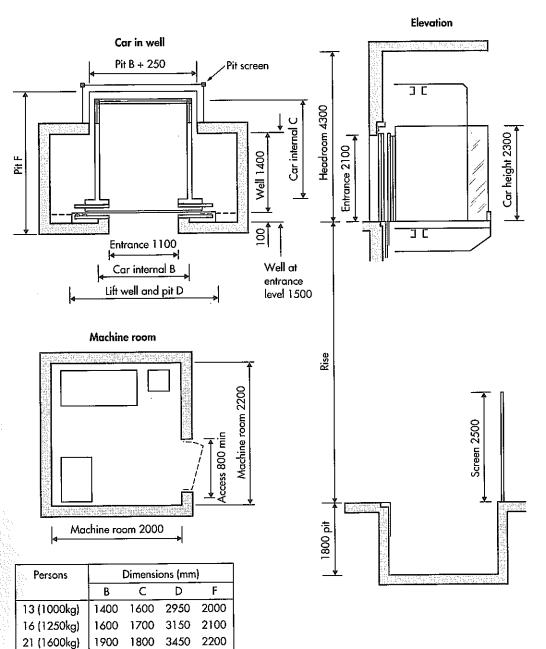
Typical space requirements for side-acting hydraulic observation lift
